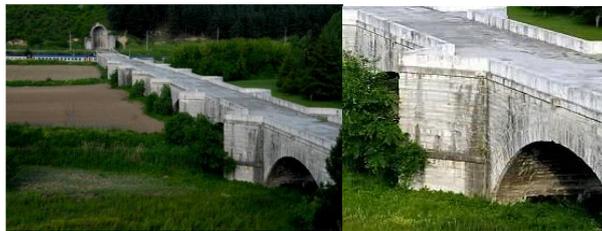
North Facade of the Bridge – Downstream and Pointed Shape Piers [8]
